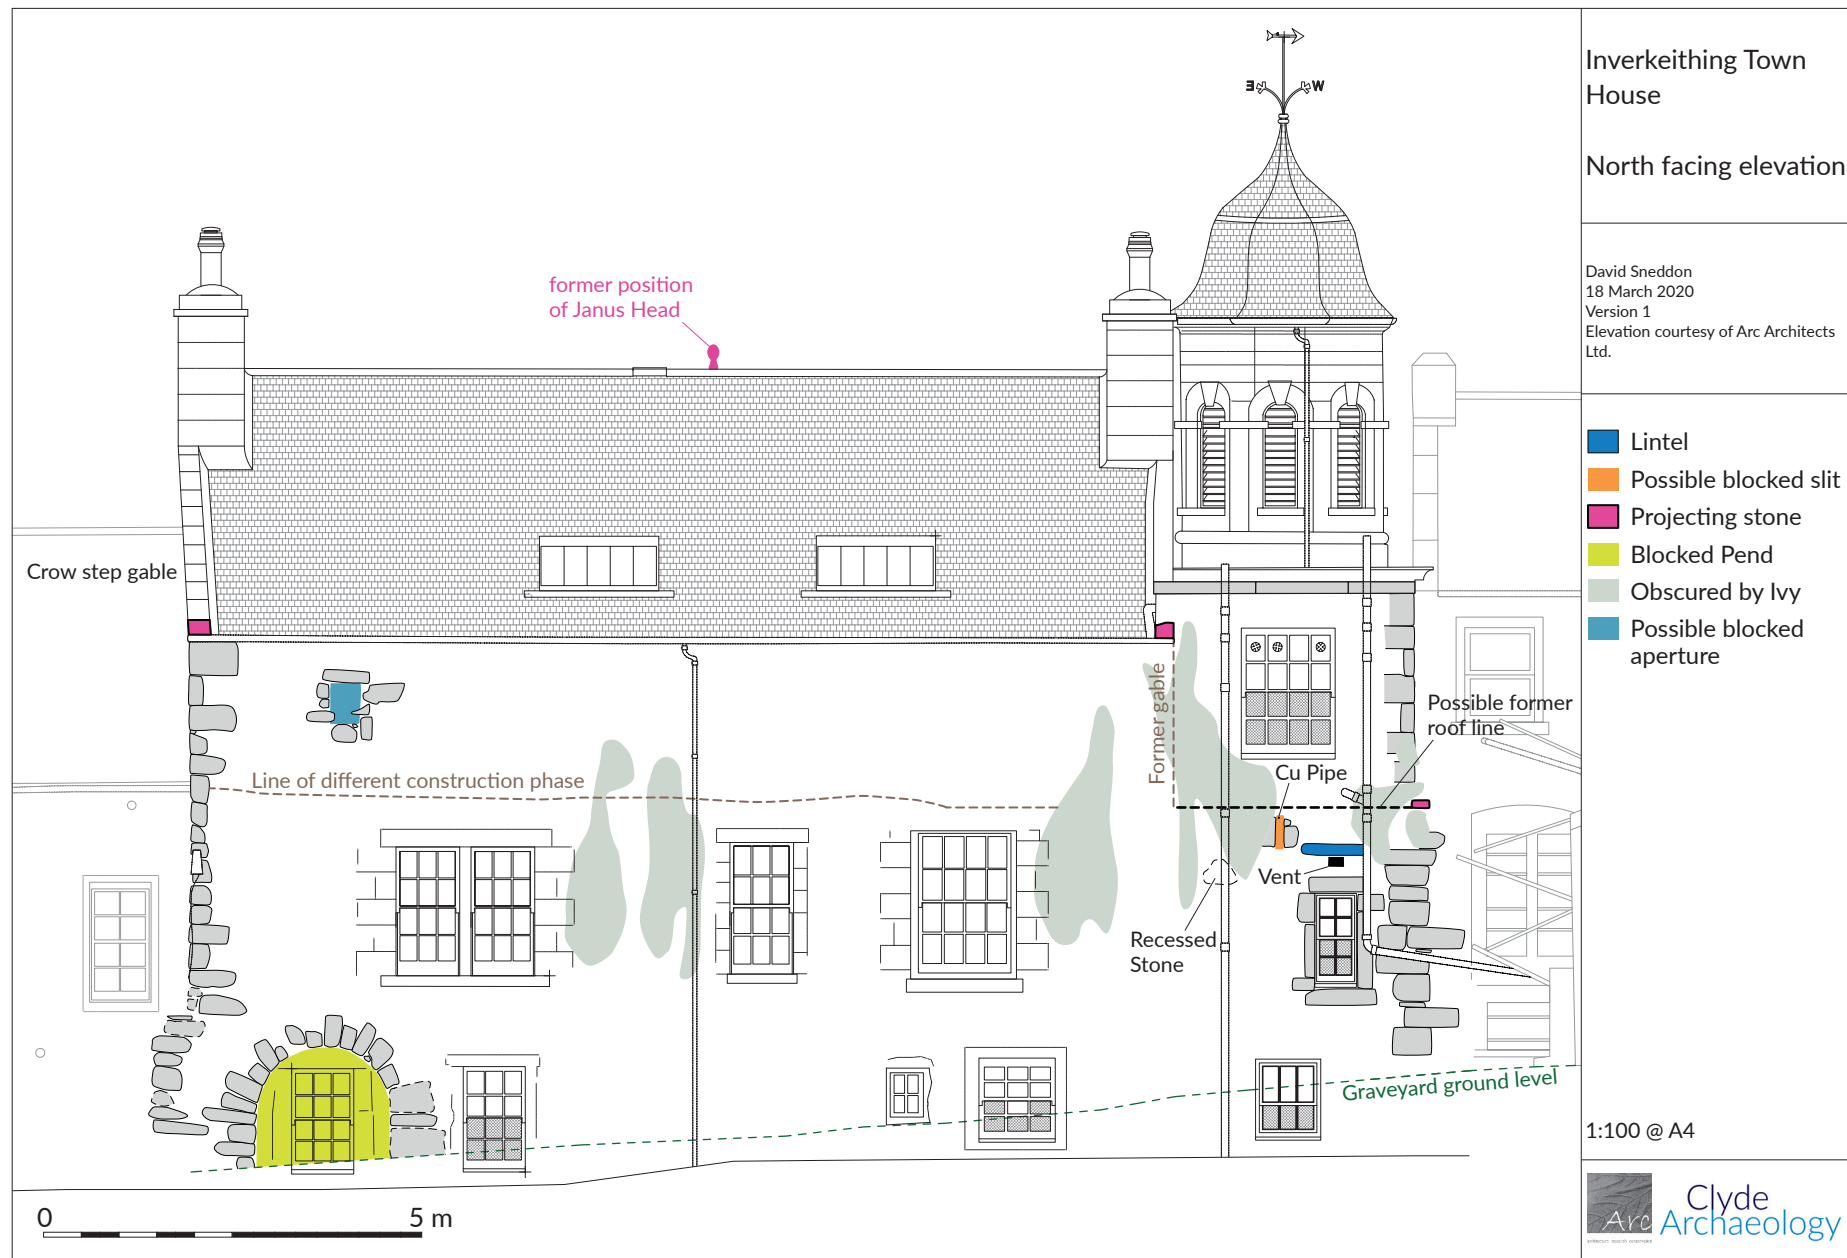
Annotated rear elevation of Town House based on drawing provided by Arc Architects Ltd.
